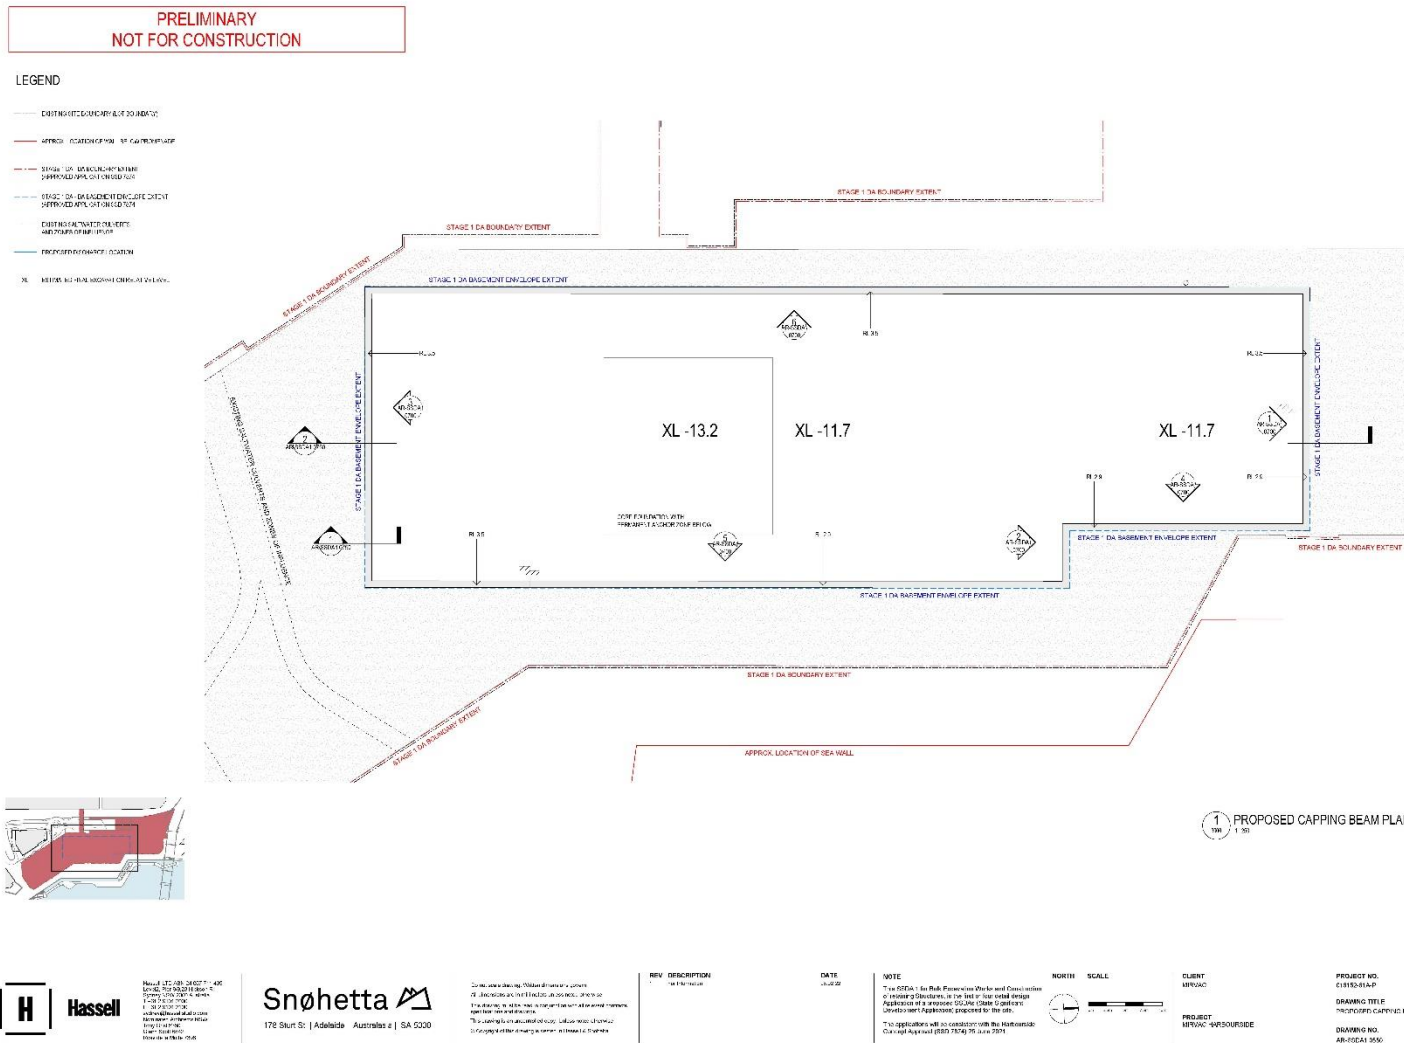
SSDA 1 proposed retention wall plan. Source: Ethos Urban.
